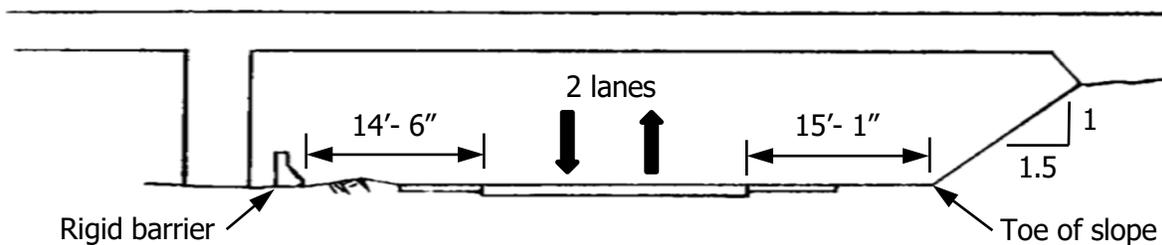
Bridge elevation view of a 2-lane, 2-way highway feature below the bridge, with a rigid barrier.
